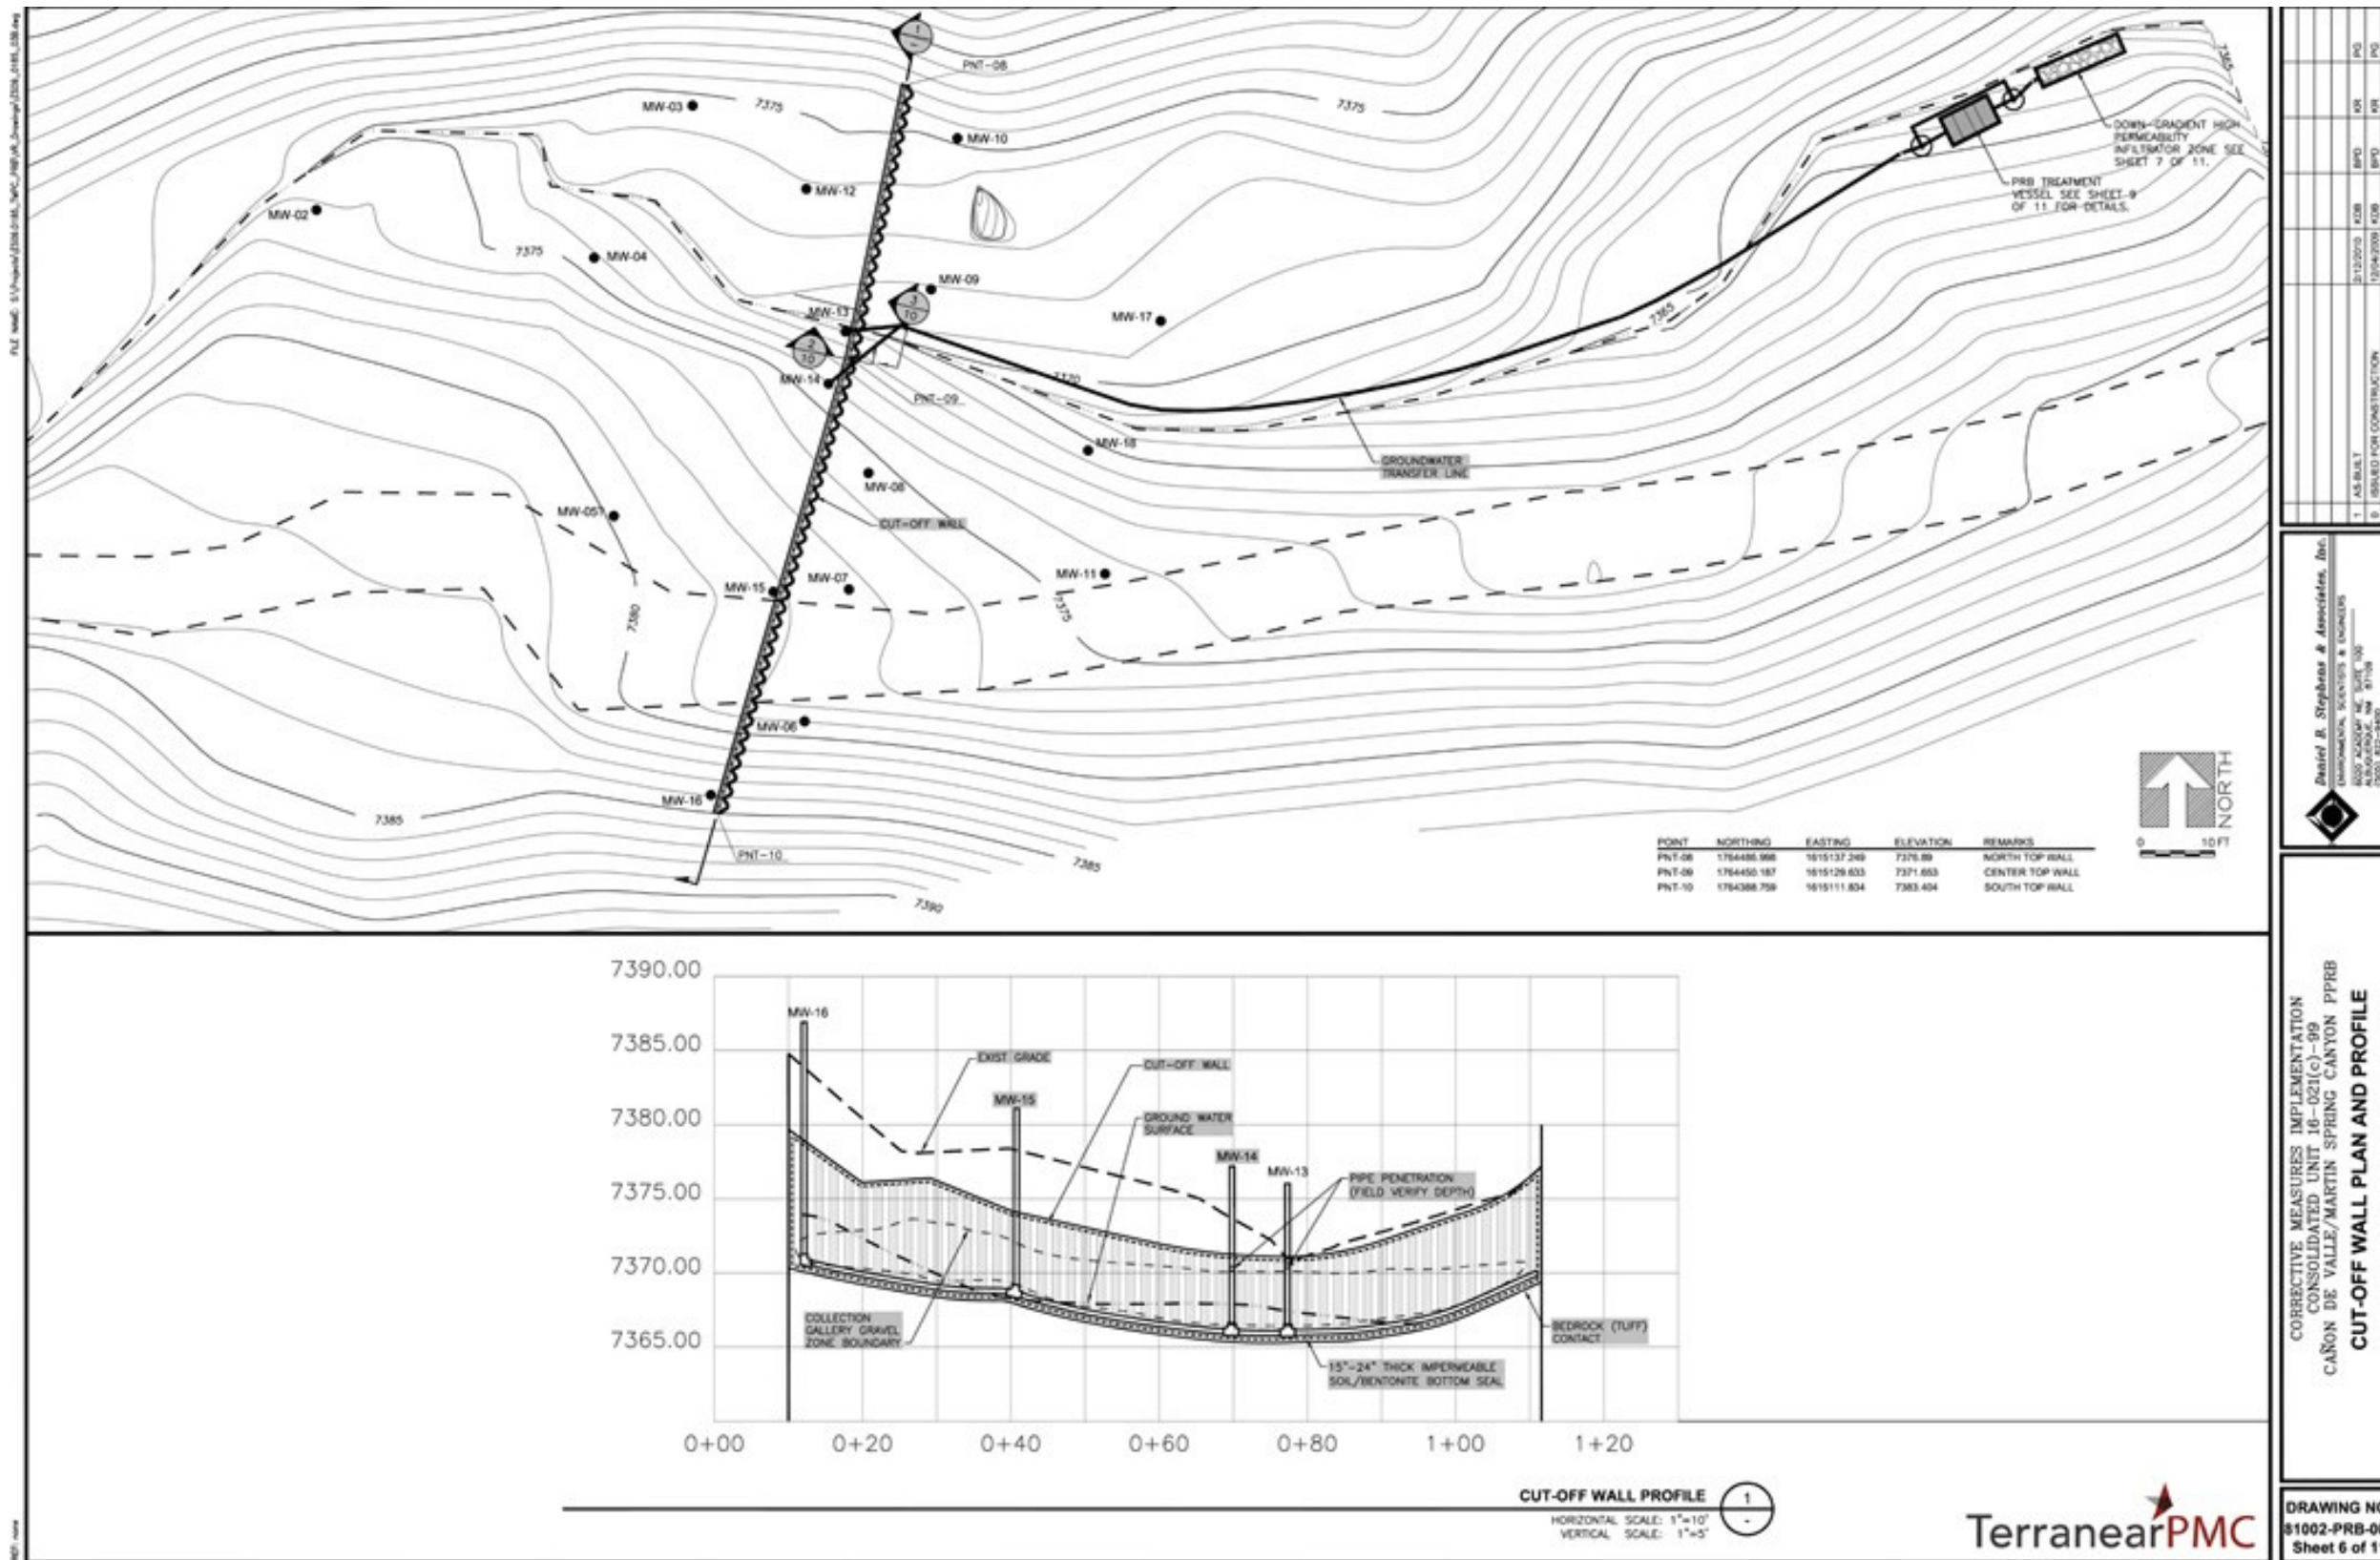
As-built drawing for the PRB, showing the cutoff wall plan and profile
